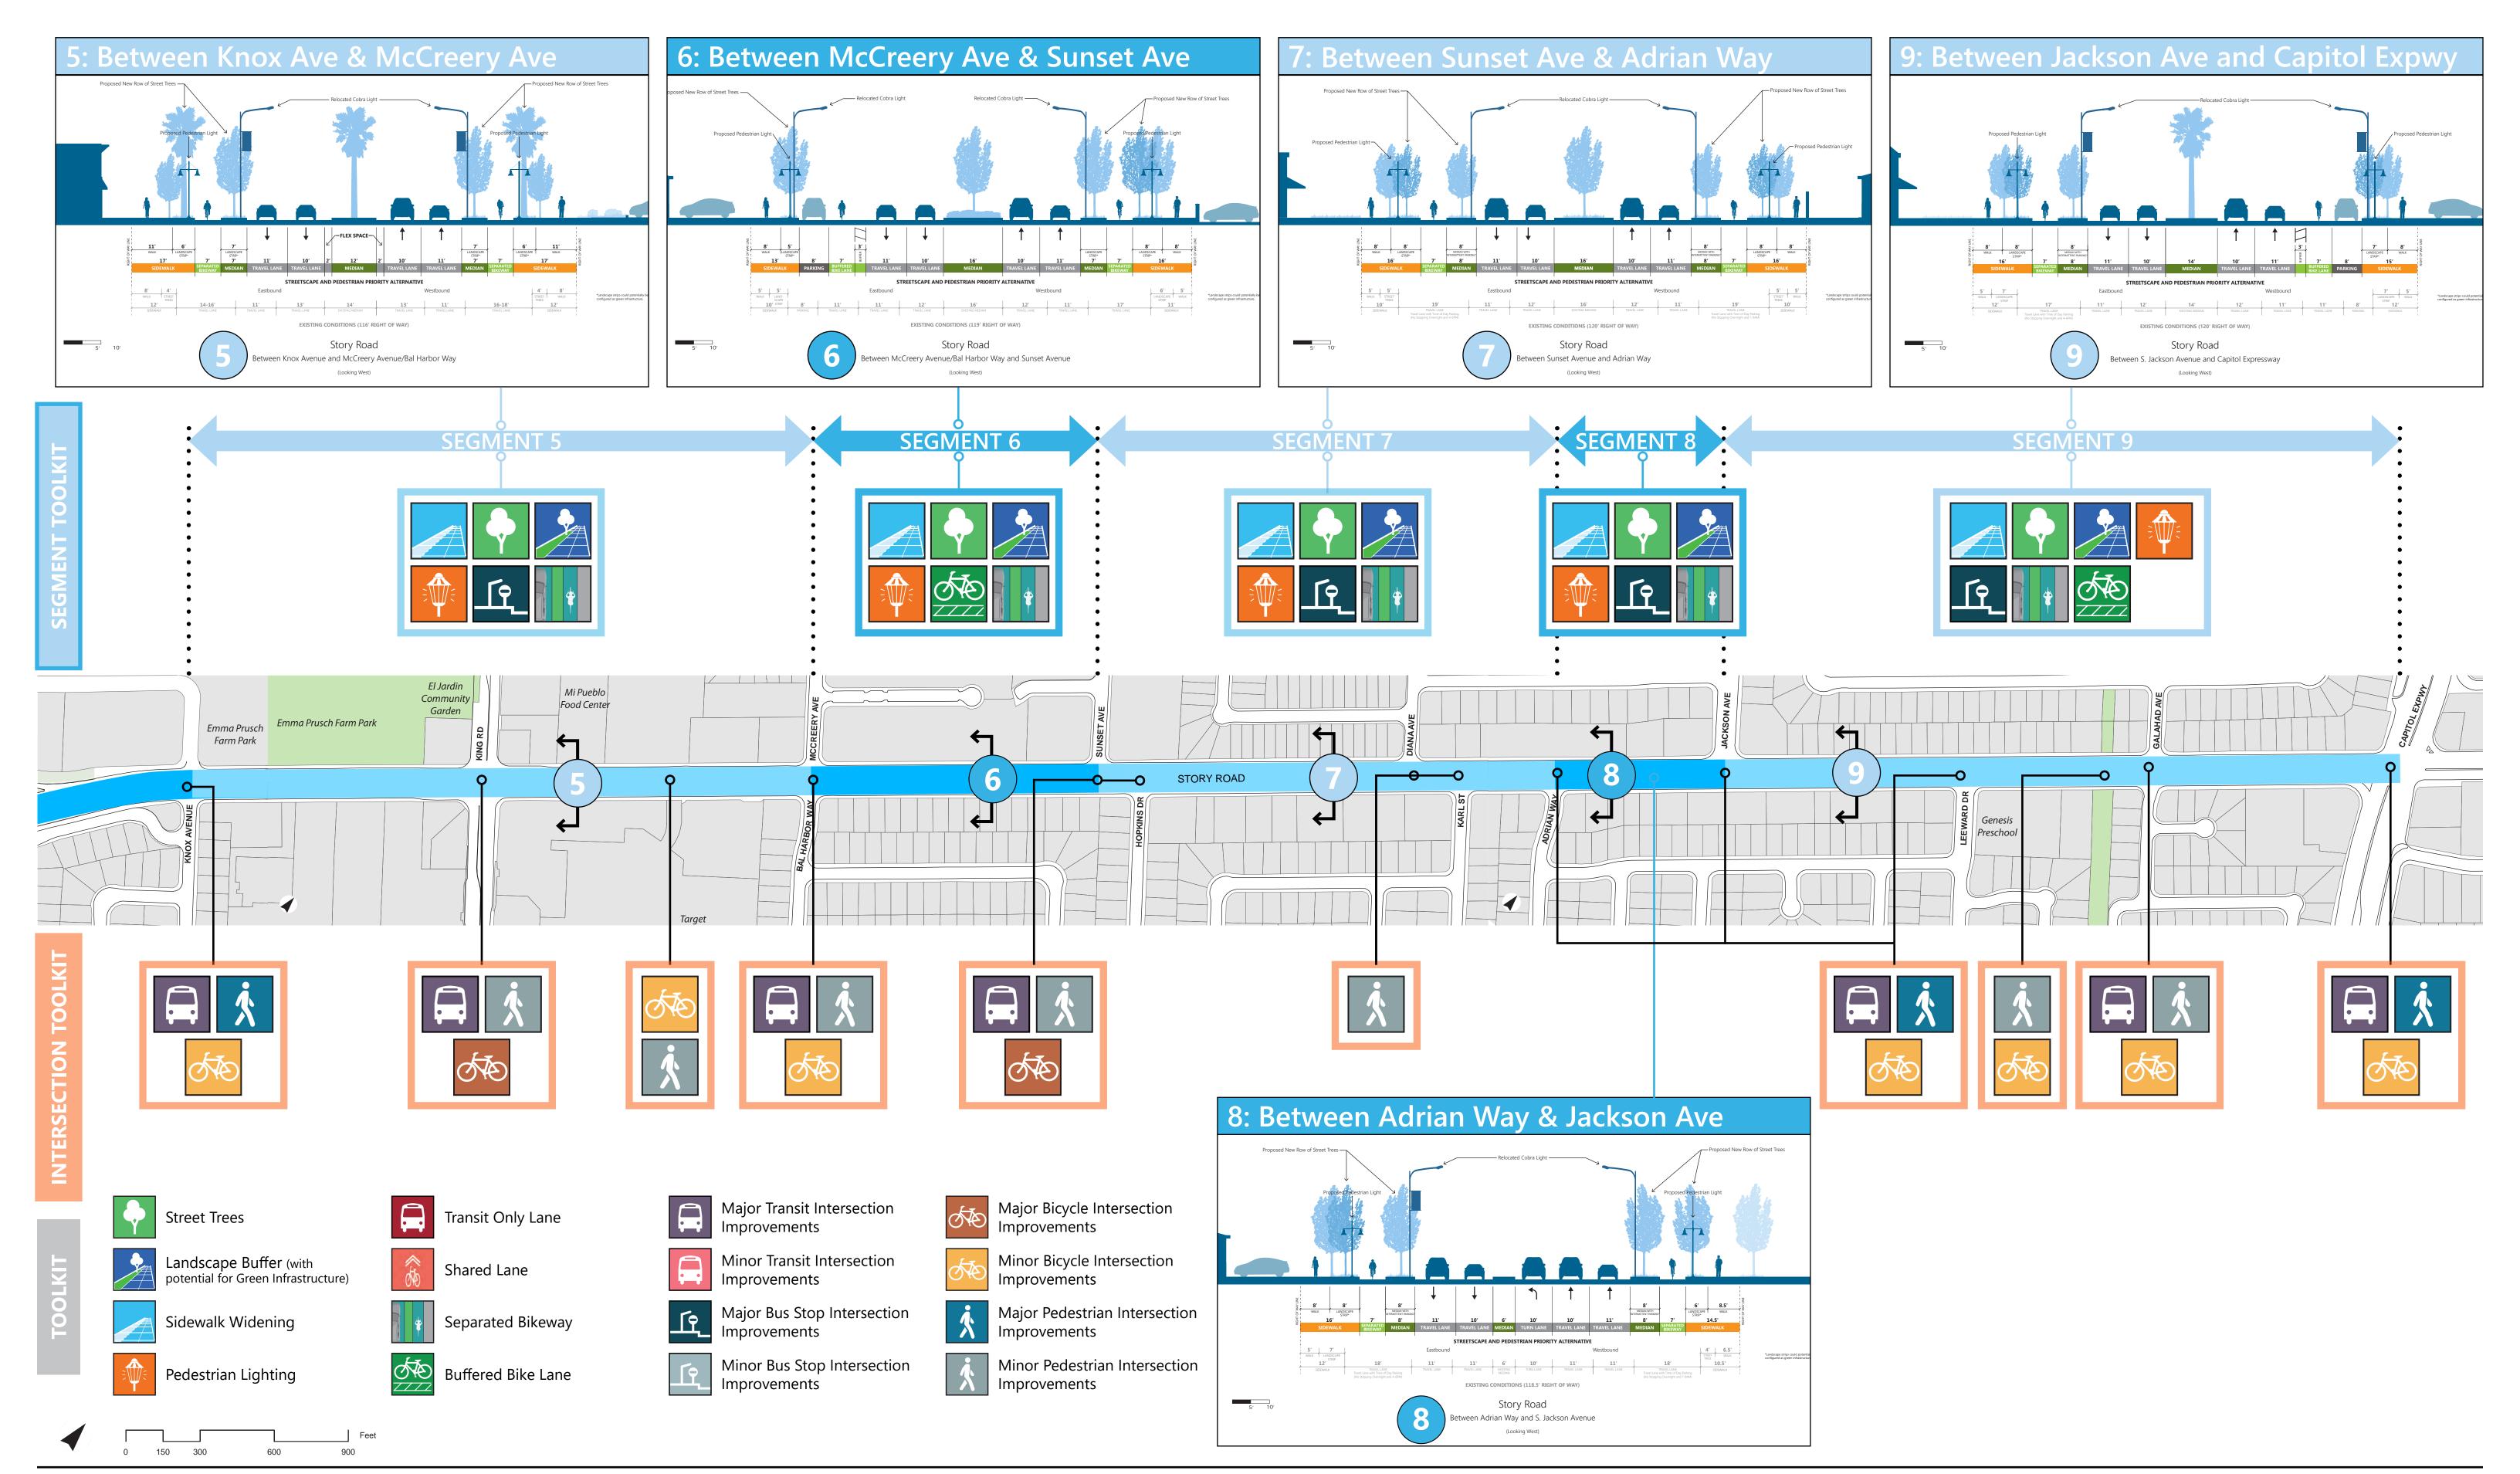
C: Story Road at Knox Avenue to Story Road at Capitol Expressway STREETSCAPE AND PEDESTRIAN PRIORITY ALTERNATIVE
